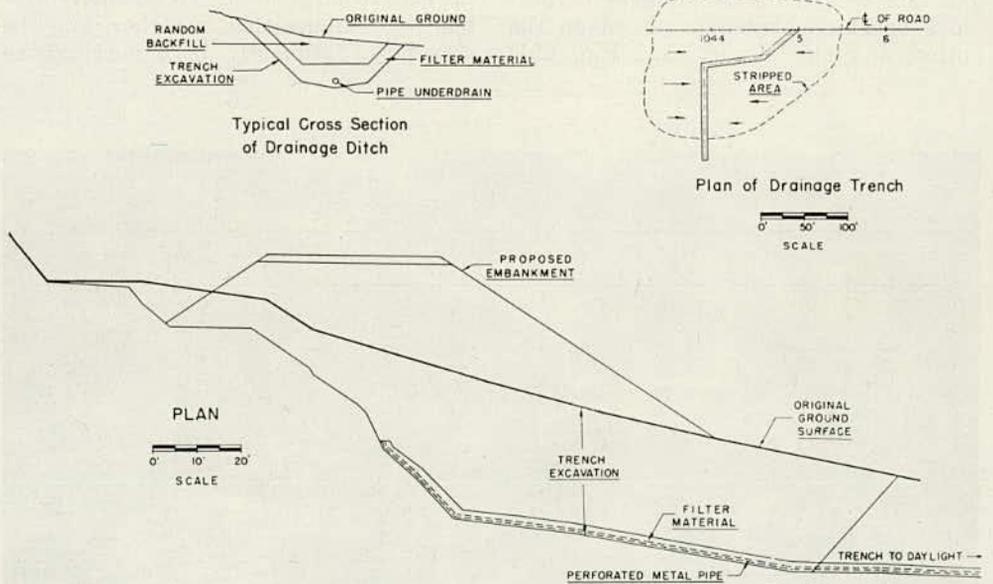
Slide prevention near Willits, Calif. by combination of stripping and drainage trench. Plan and cross-section of preventive treatment consisting of stripping unsuitable soil and constructing drainage trenches. (Sketch furnished by C. P. Sweet, courtesy of California Division of Highways)
